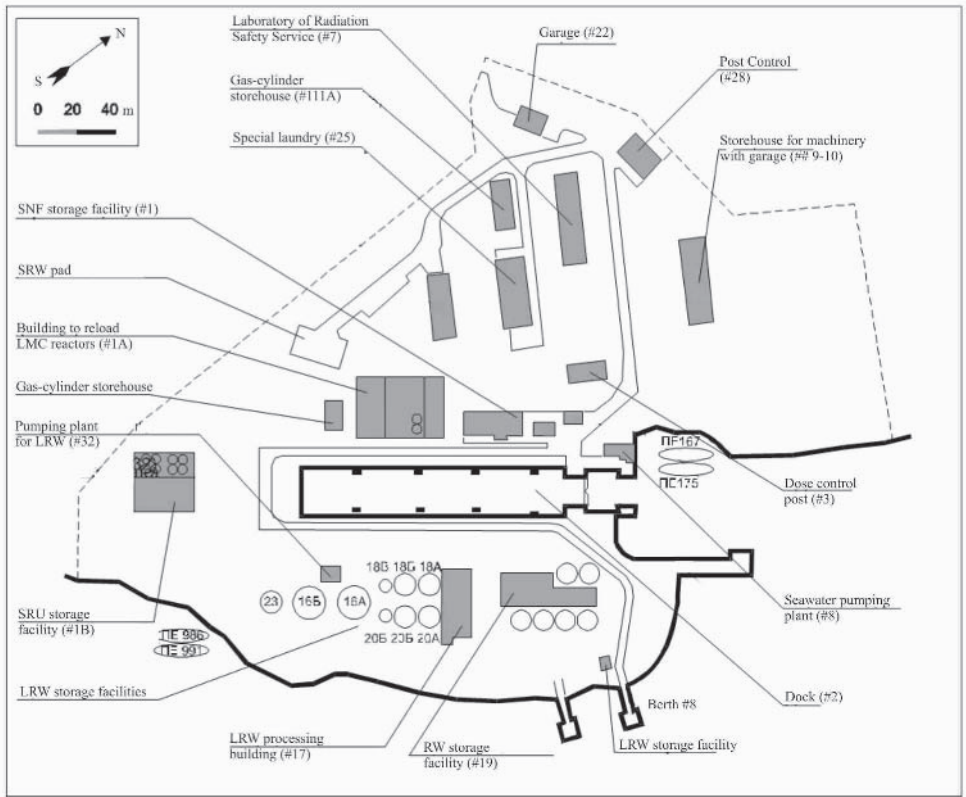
Layout of main buildings and constructions of "SevRAO" Branch #2
